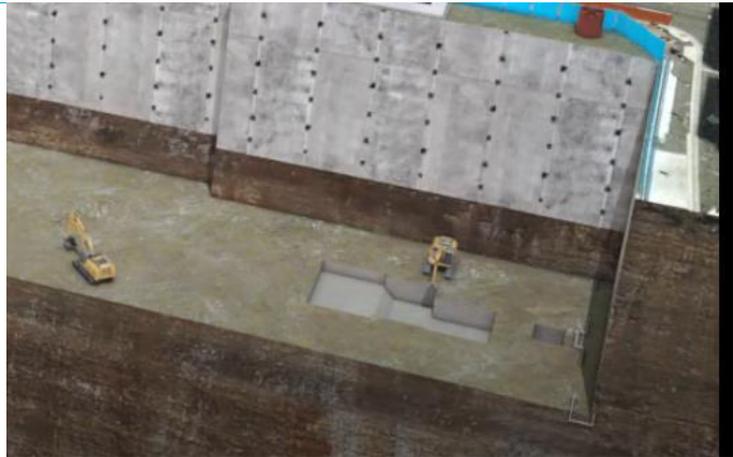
Crows Nest Station Construction Site and Receiver Areas
